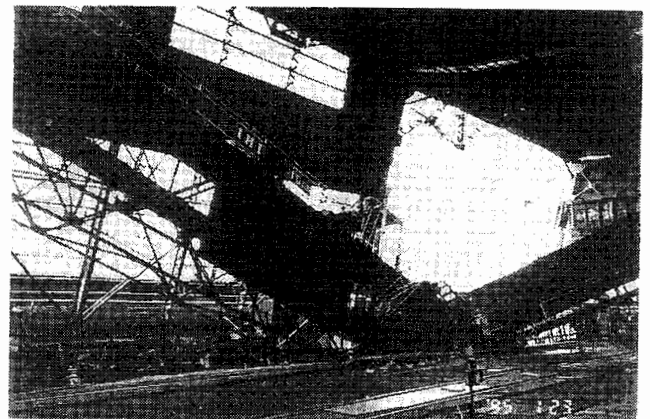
Falling of overhead travelling crane due to collapse of factory building.
